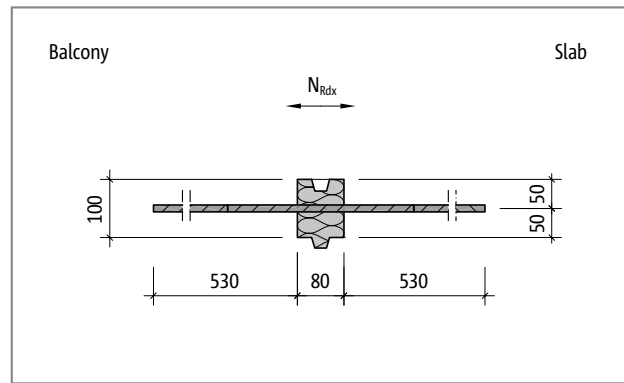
Schöck Isokorb® T type H-NN2: Product layout
